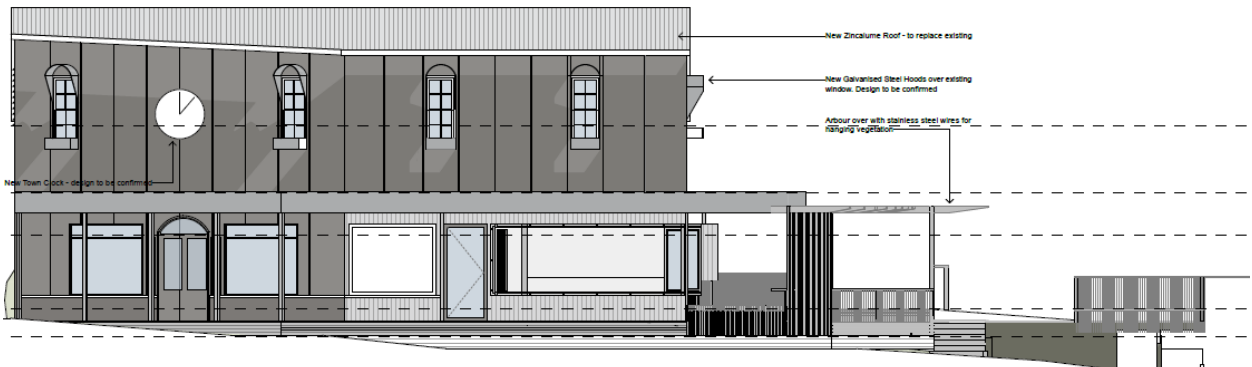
Caplick Way elevation (Old Highway Motors building in foreground)
